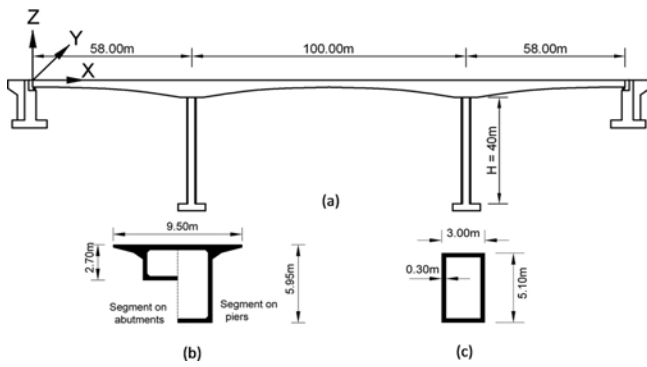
Description of Bridge: (a) Elevation of Bridge, (b) Cross-section of Segments, (c) Cross-section of Pier
